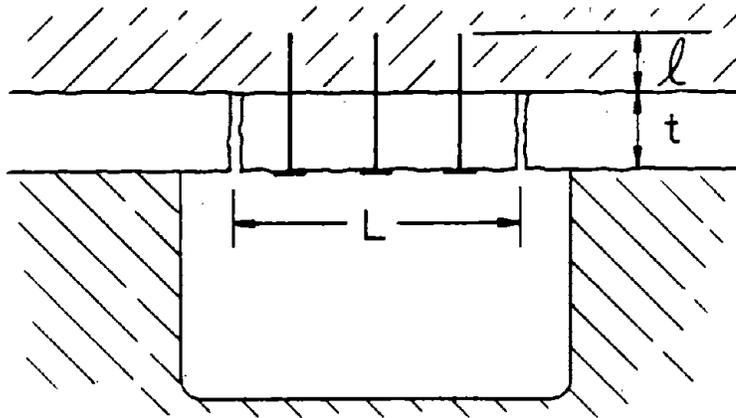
Simple Suspension of a Roof Slab [2.47]
